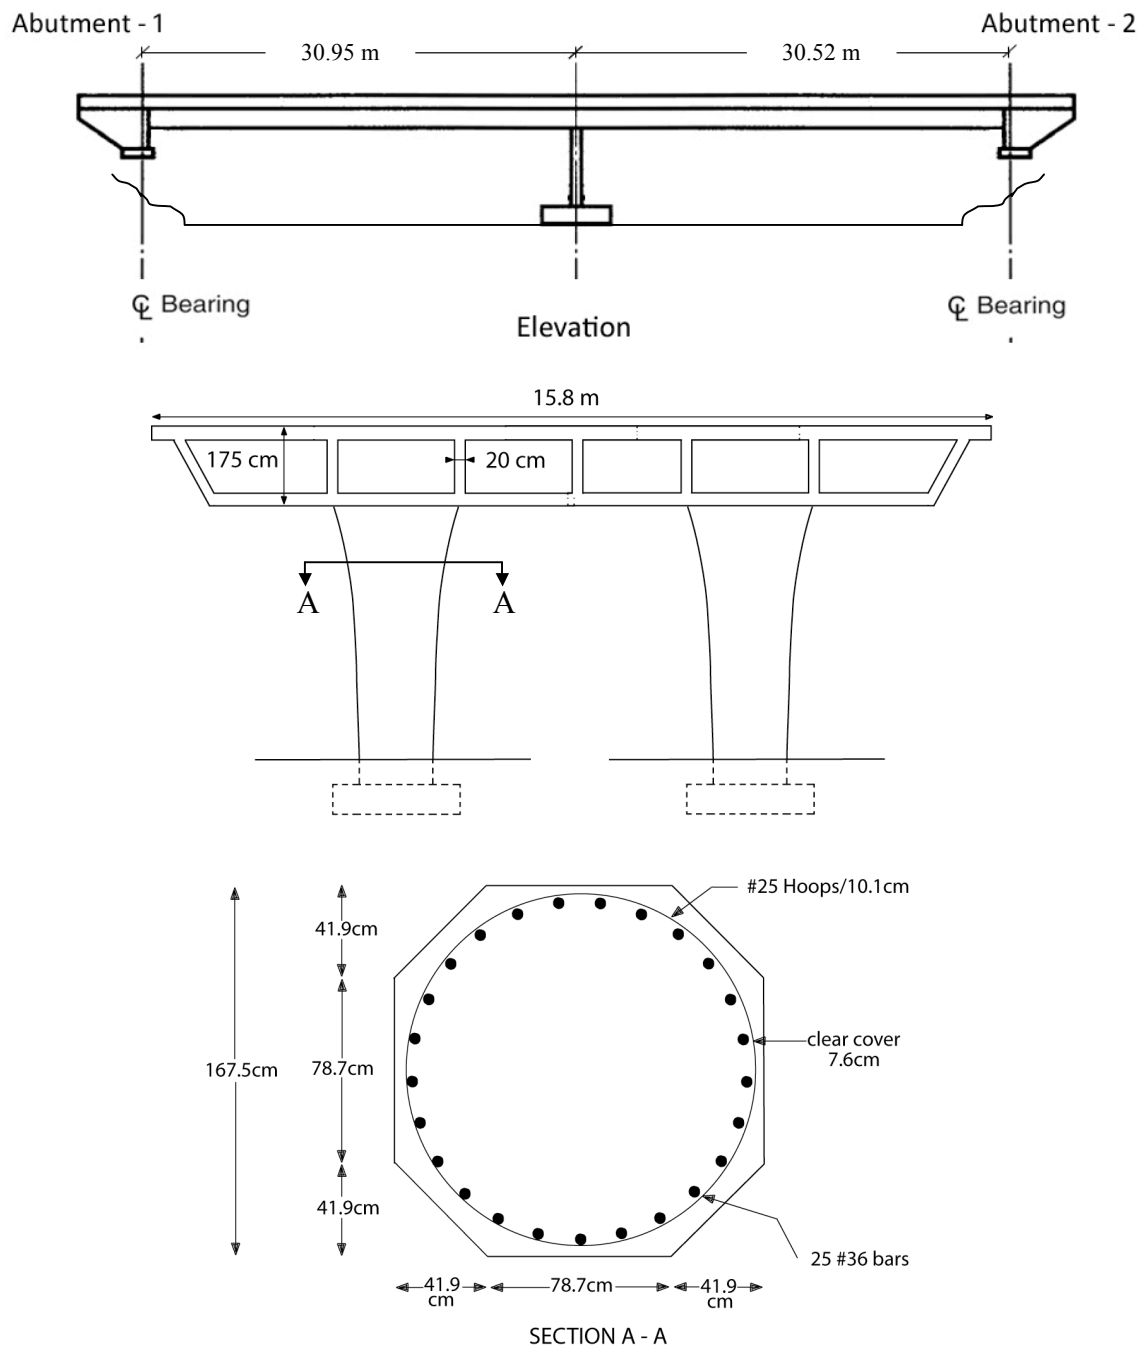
Elevation, deck and column dimensions, and column-section details of the single-bent overpass.
